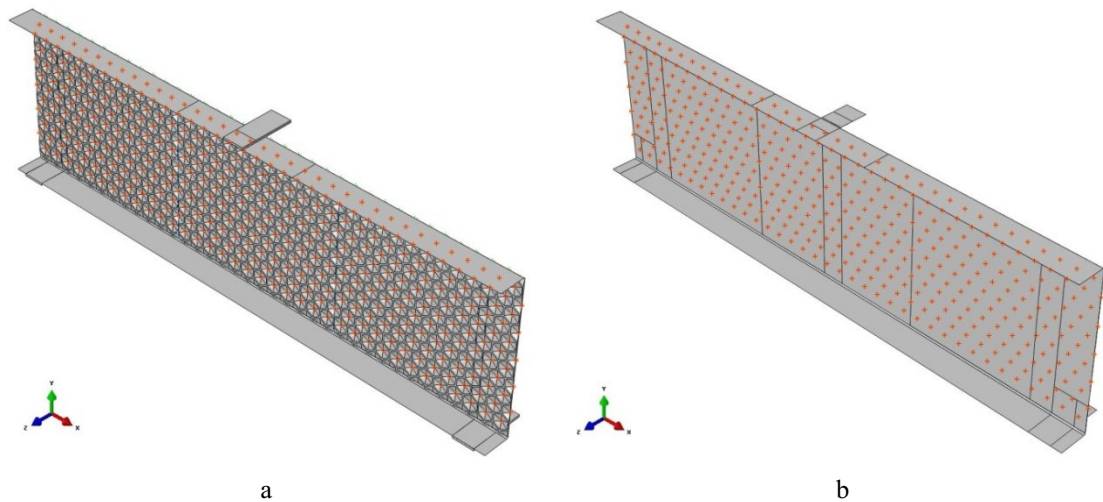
The weld points modeling for structured and flat web specimens: with structured sheets (a) and flat plates (b)
